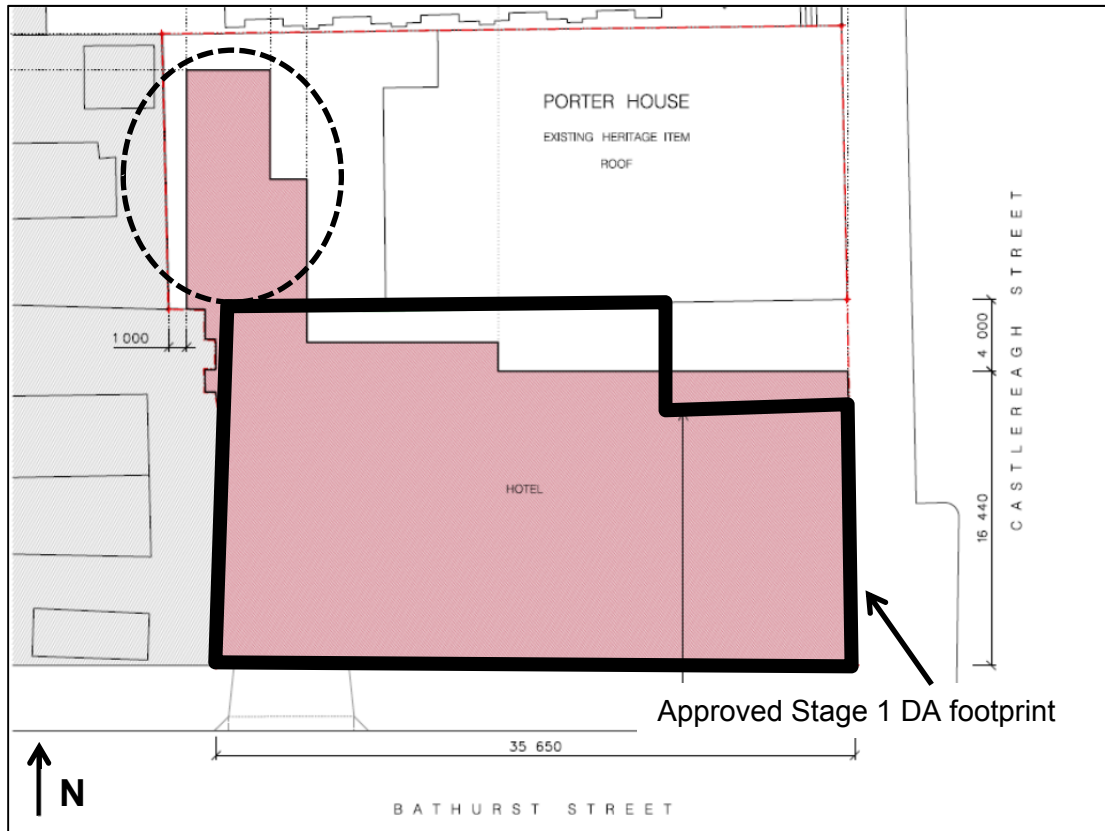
The variations proposed to the Stage 1 building footprint on a typical podium level
